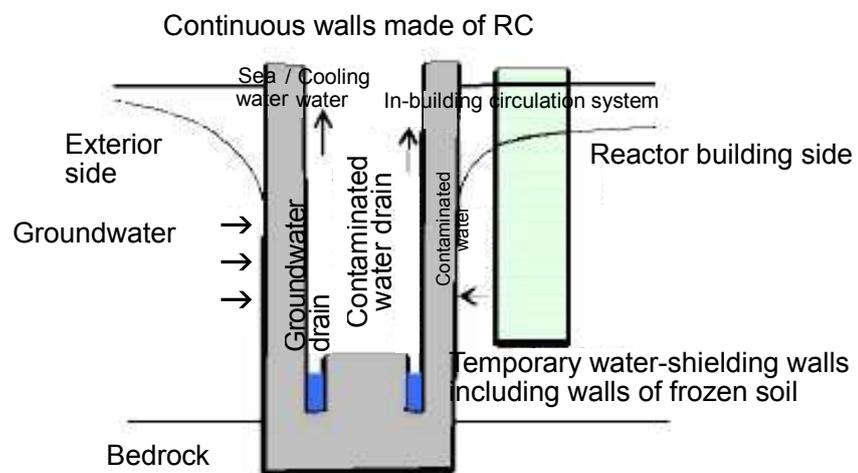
Underground double reinforced concrete (RC) continuous walls assumed to shield water for 300 years
